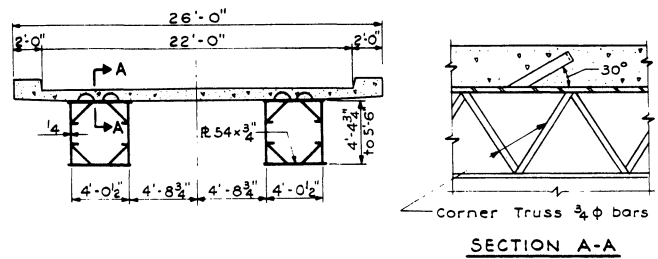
Two-lane highway bridge, King County, Washington. Span 110 ft. Two boxes with cast-in-place concrete deck slab. Pairs of shear connectors made of 2 x 1/4-in. flat bars welded at a 30-degree angle to the top plate achieve composite action. Corner trusses are used to make assembly extremely rigid
